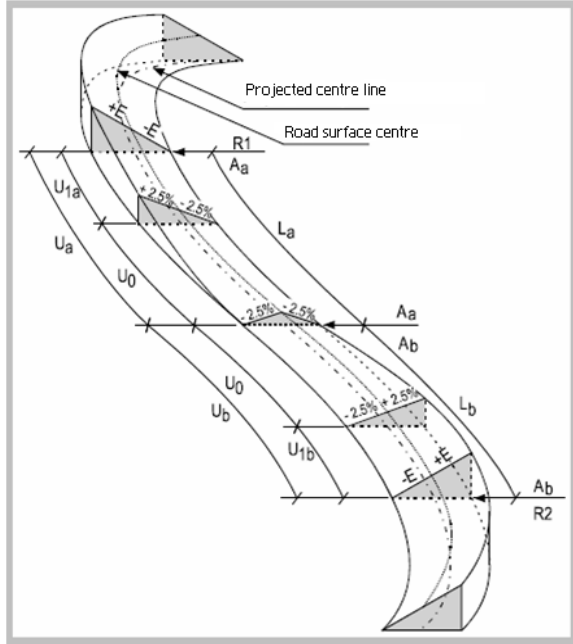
Super-elevation on straight road section, transition into curves and both left and right curves.
